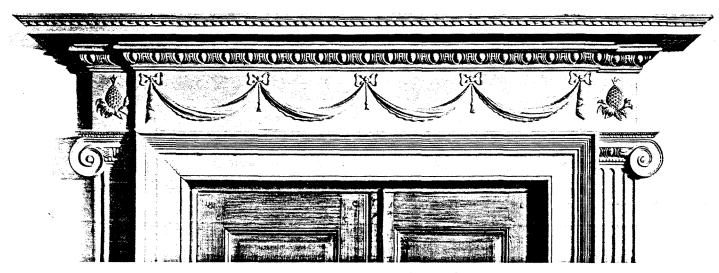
Detail of parlor doorway at Point of Honor. Source: Lynchburg-An Architectural History.
